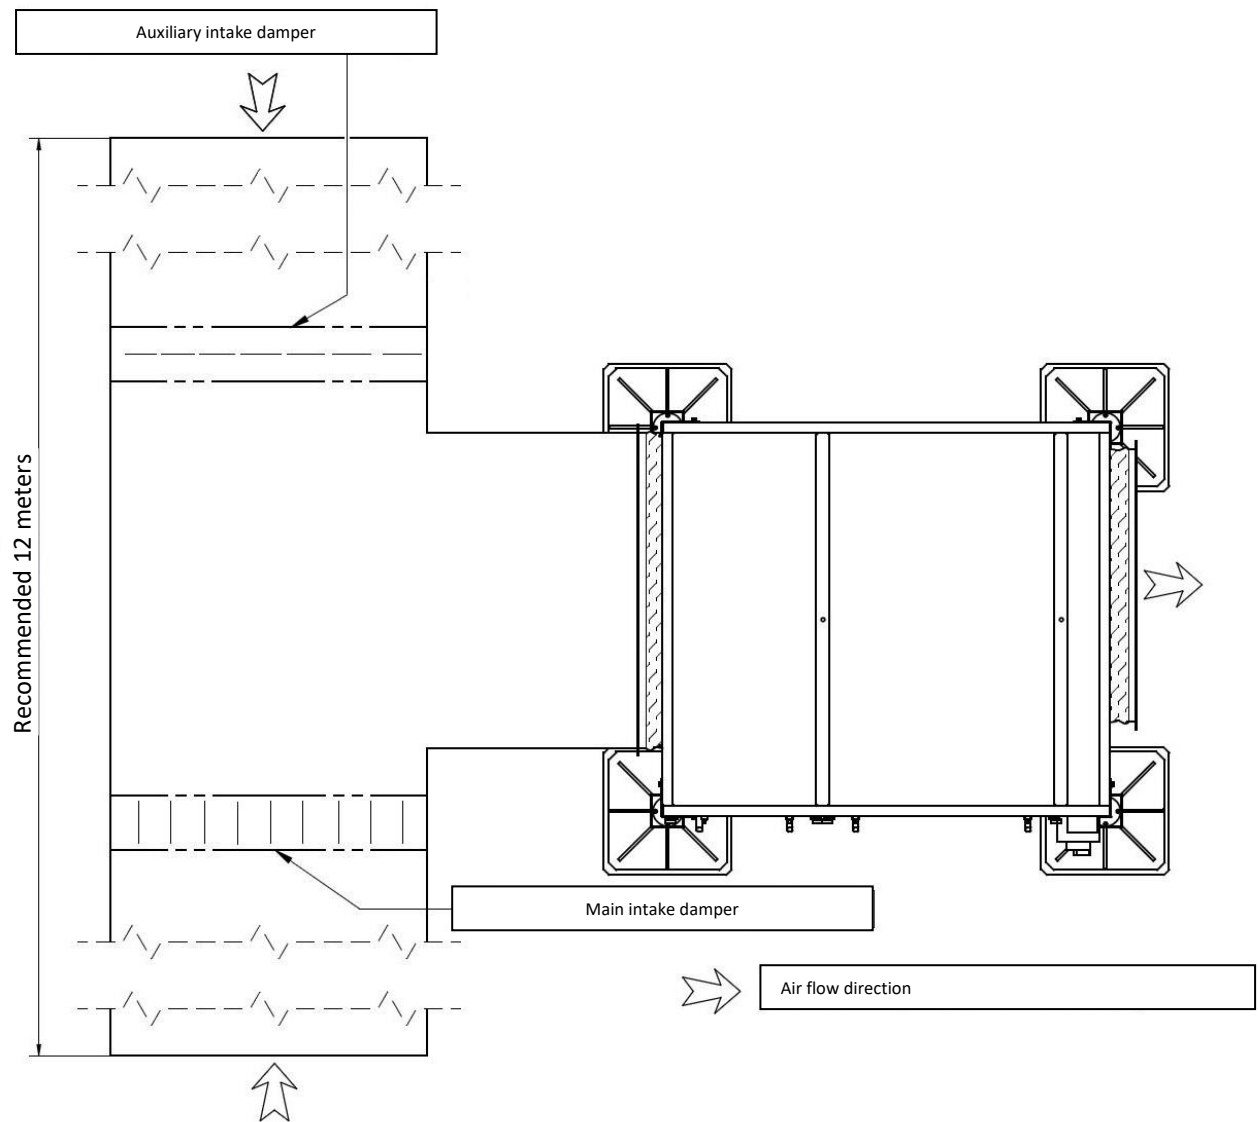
Two air dampers system (primary and back-up, components of the two air intake system) connected to iSWAY-FC.
